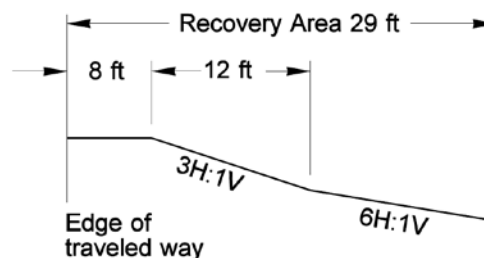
Design Clear Zone for Ditch Sections
